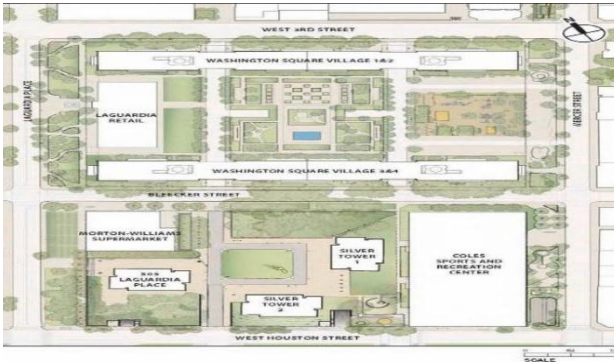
Layout plan of Coles Sports and Recreation Center, New York University, New York City, USA
